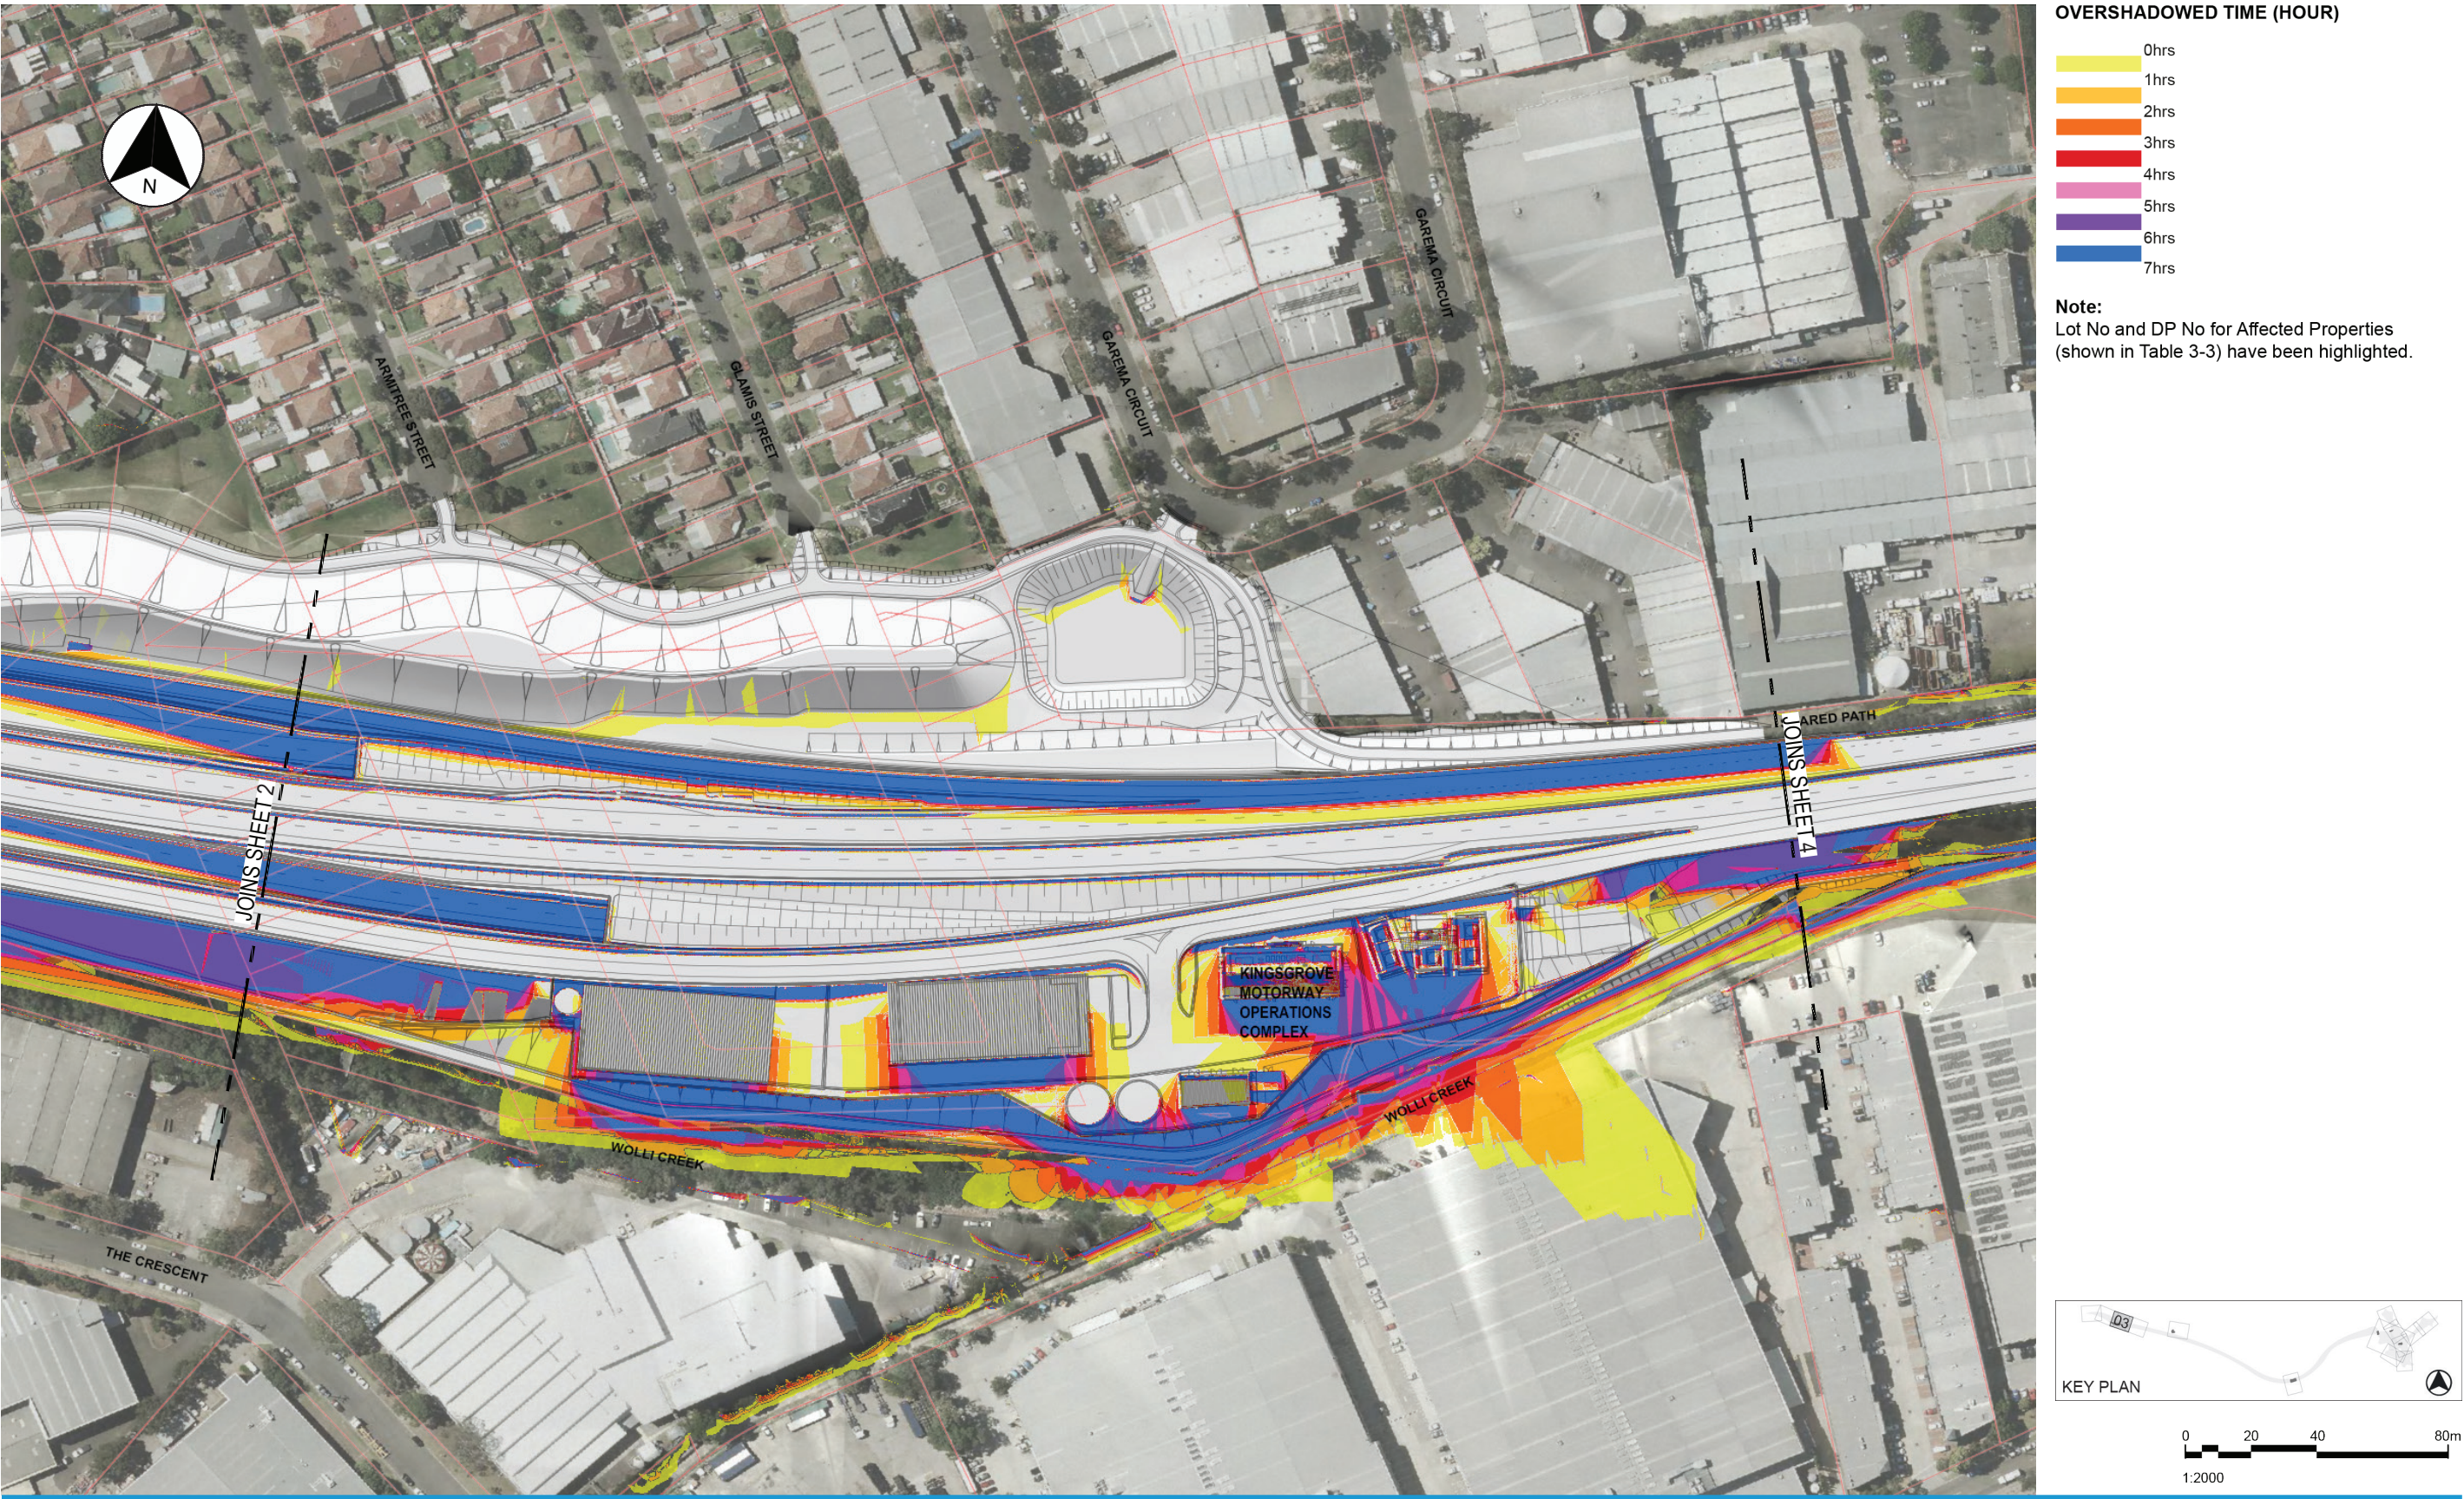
Overshadowing Assessment Plan - Sheet 3 of 14 - 1:2000
